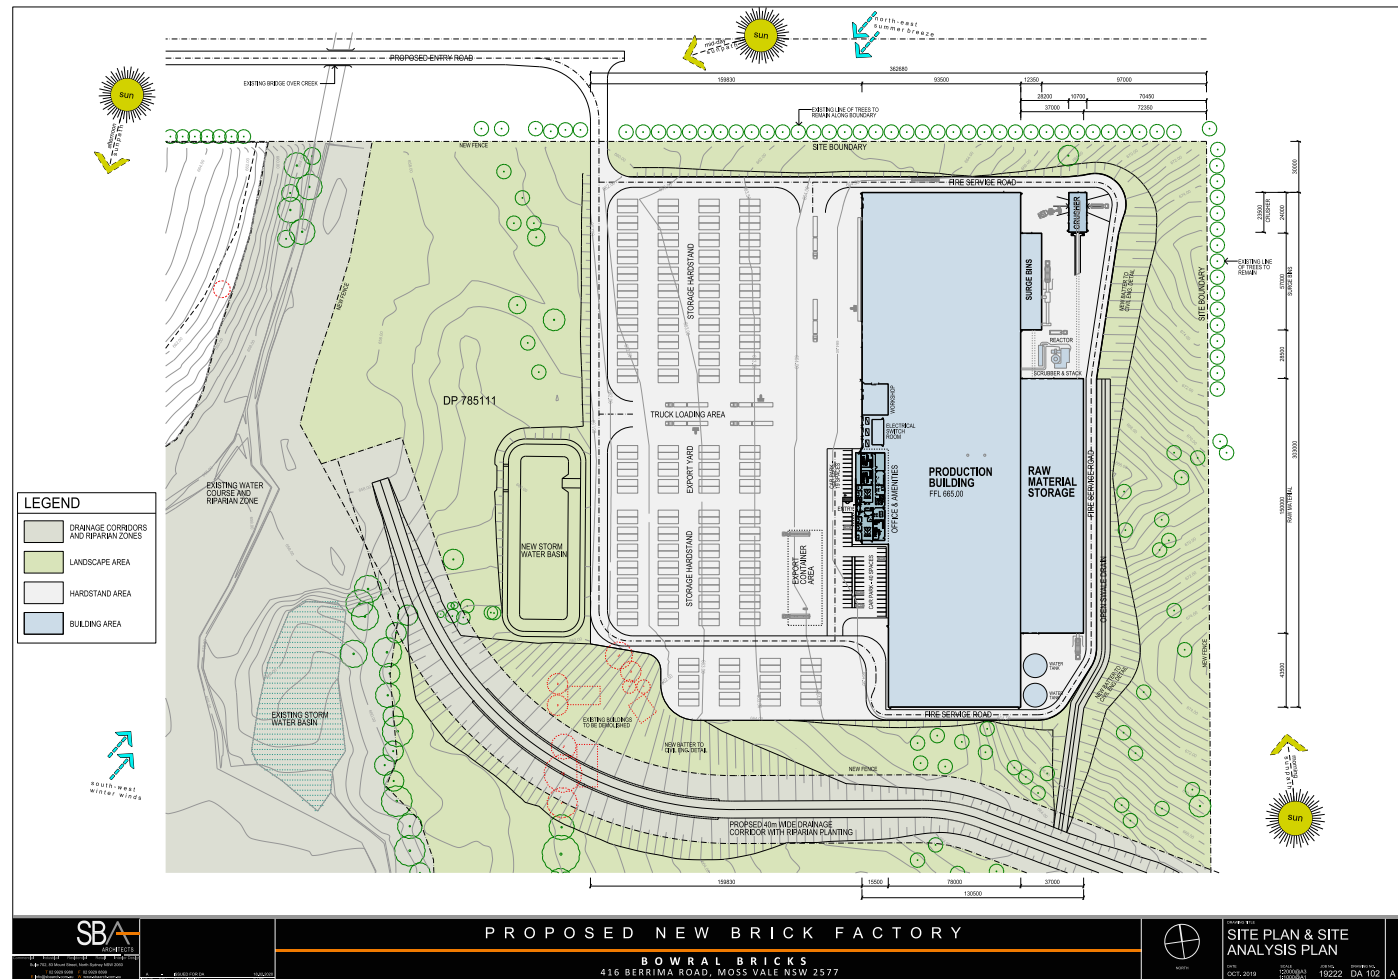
Proposed Brick Works Site Plan (Source: SBA)
